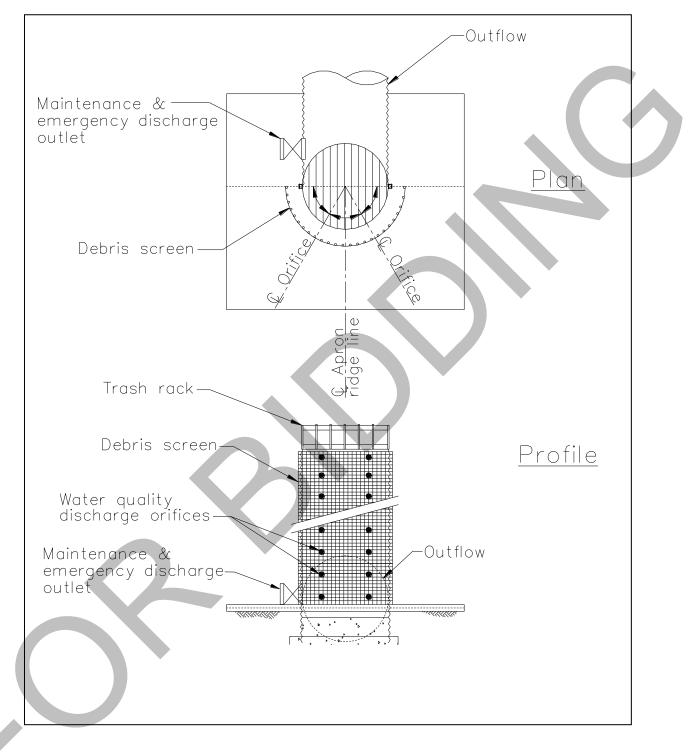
MULTIPLE ORIFICE OUTLET RISER NOT TO SCALE
